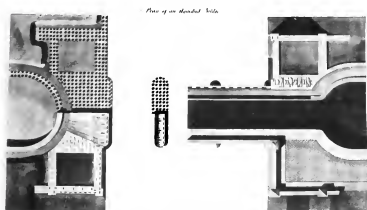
, PLATE 2. Plan of an aqueduct bridge, in shades of sepia, and pink
